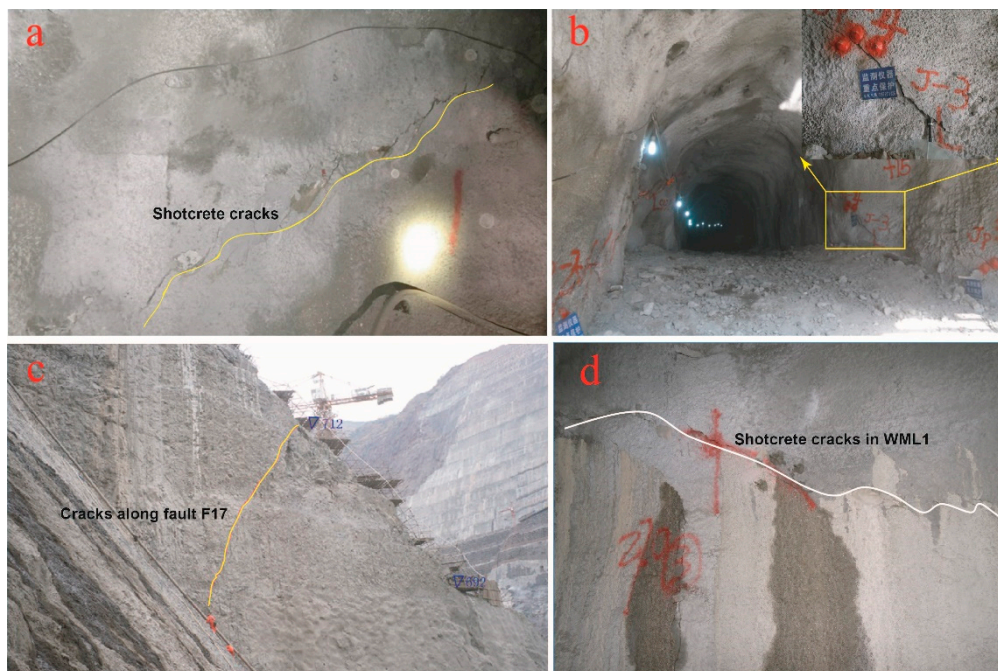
(a) Sprayed concrete cracks occurred at the sidewall of PSL2, (b) sprayed concrete spalling occurred at the peripheries of the entrances to WML2, (c) cracks occurred along fault F17 at the downstream slope of the spandrel groove, and (d) Sprayed shotcrete spalling occurred at the sidewall of WML1.
